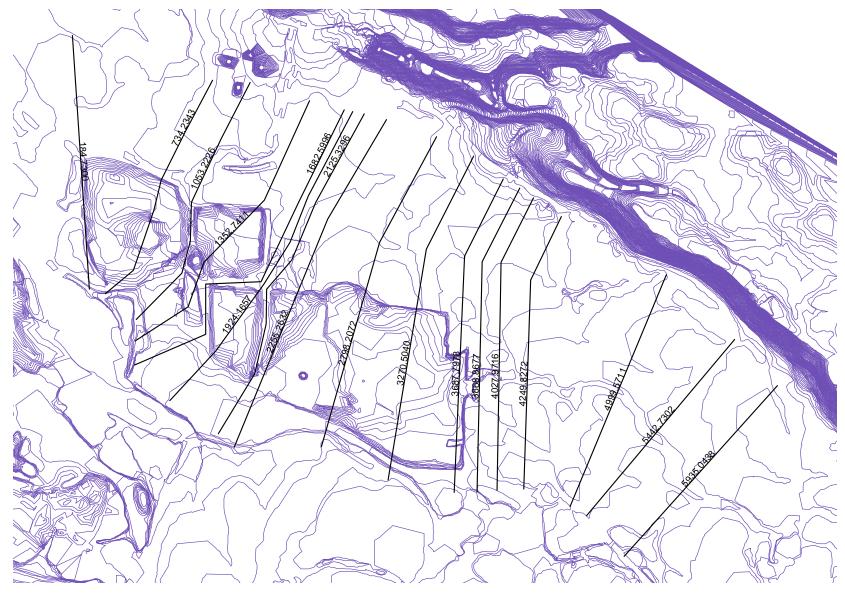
Plan view of the Daybreak Ponds showing locations of cross sections used in the hydraulic analysis.
